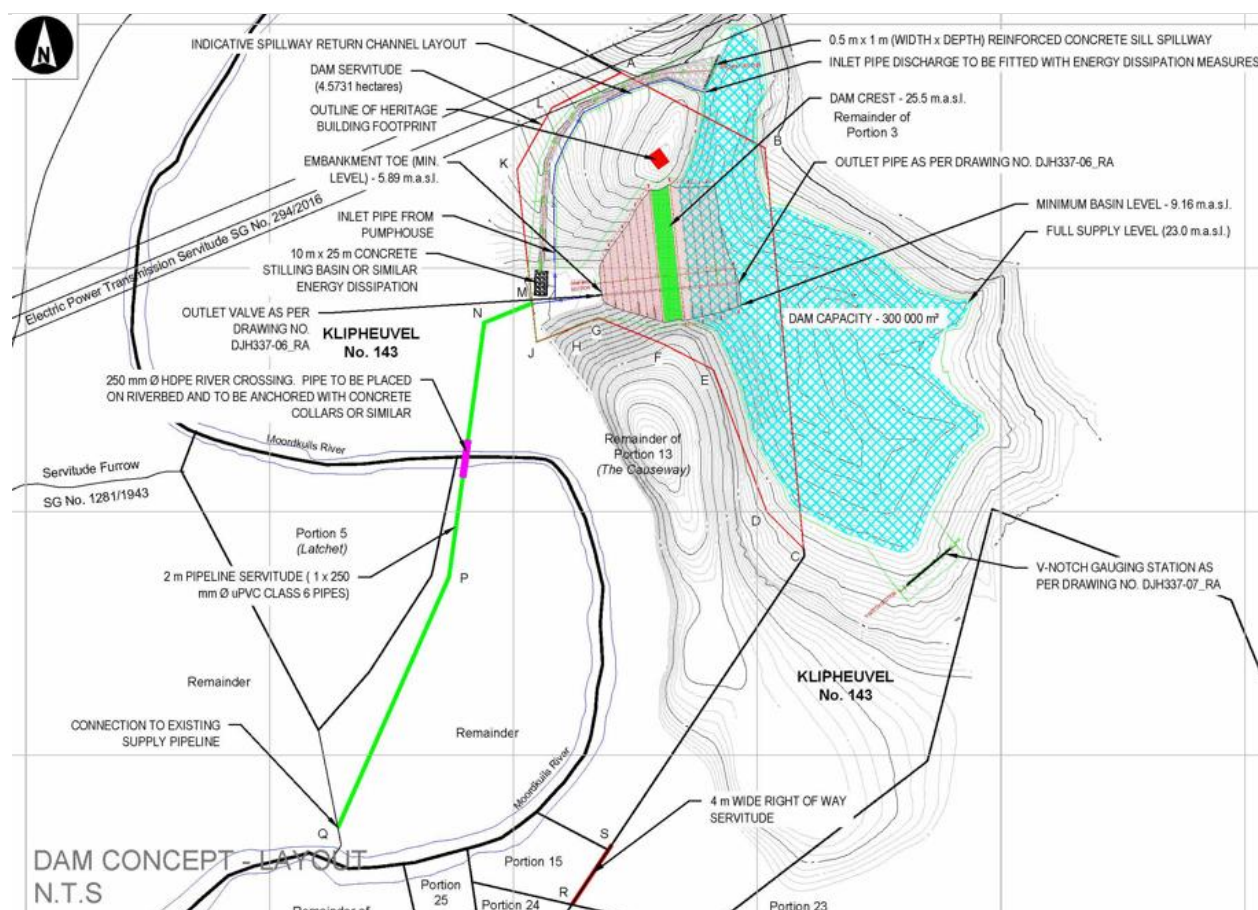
The concept layout plan for the proposed Oudrift Dam (HagenBrink, 2026).
